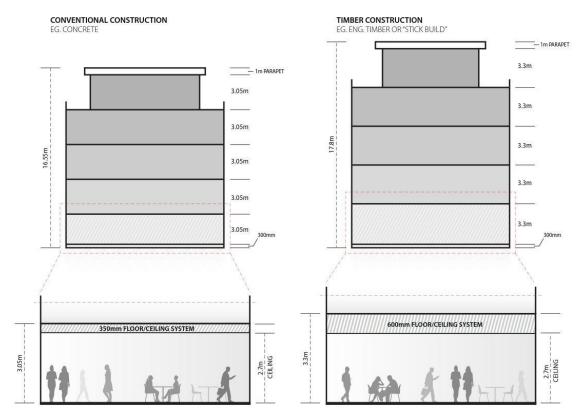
Comparison of a theoretical five storey building constructed with concrete (left) and timber (right)
